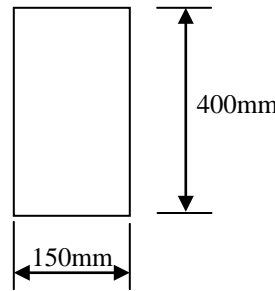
B: Cross-Section of the Nigerian grown Apa timber bridge beam
